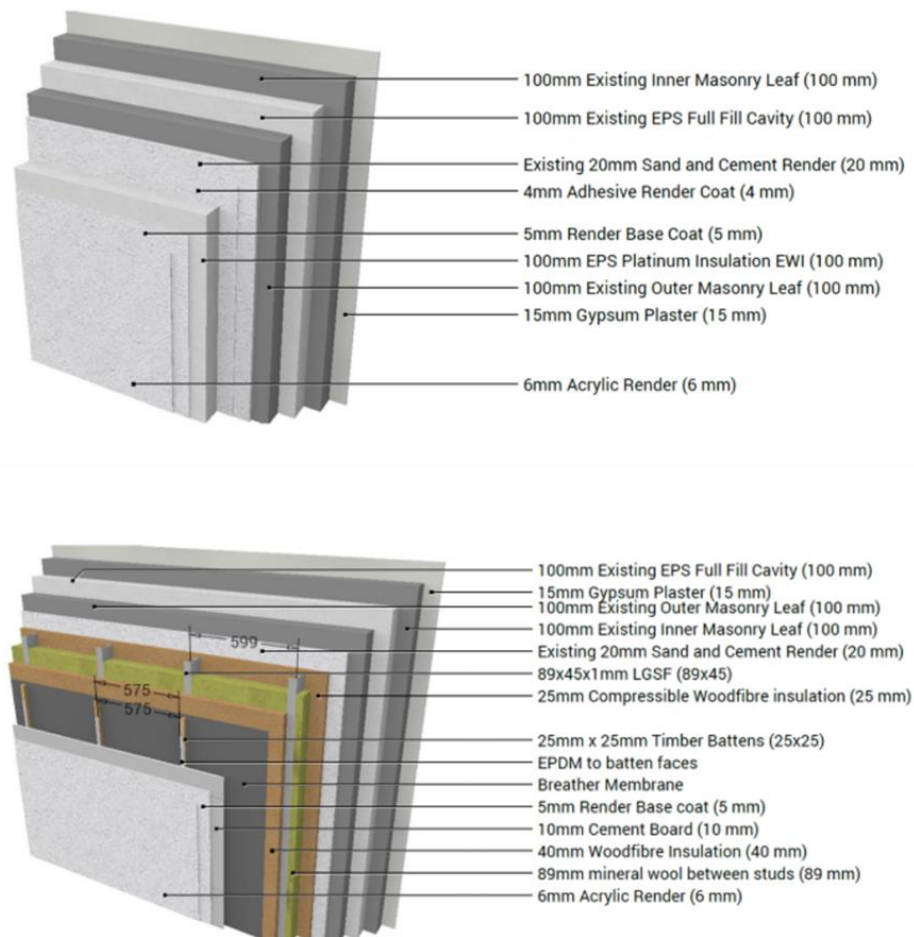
3D schematic cutaways showing construction build-up of retrofit systems and host masonry cavity wall. (Kavanagh, 2025 [60]).
